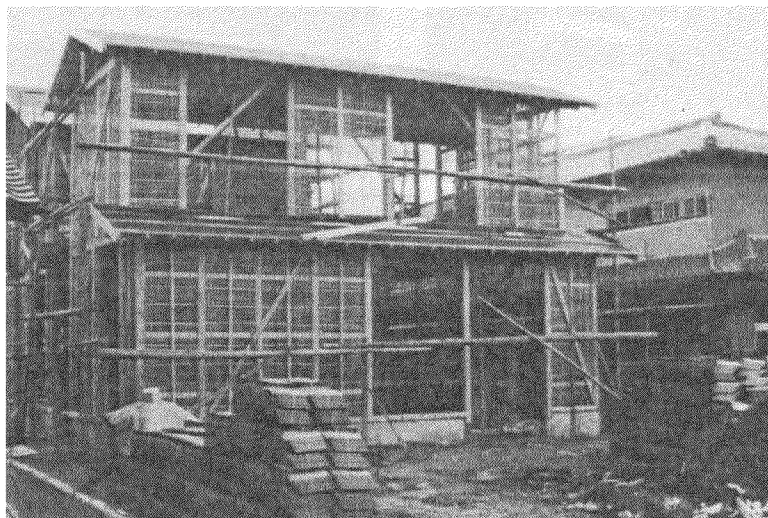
Framed-up house with lath installed, prior to application of mud. Note roof tiles in foreground.
